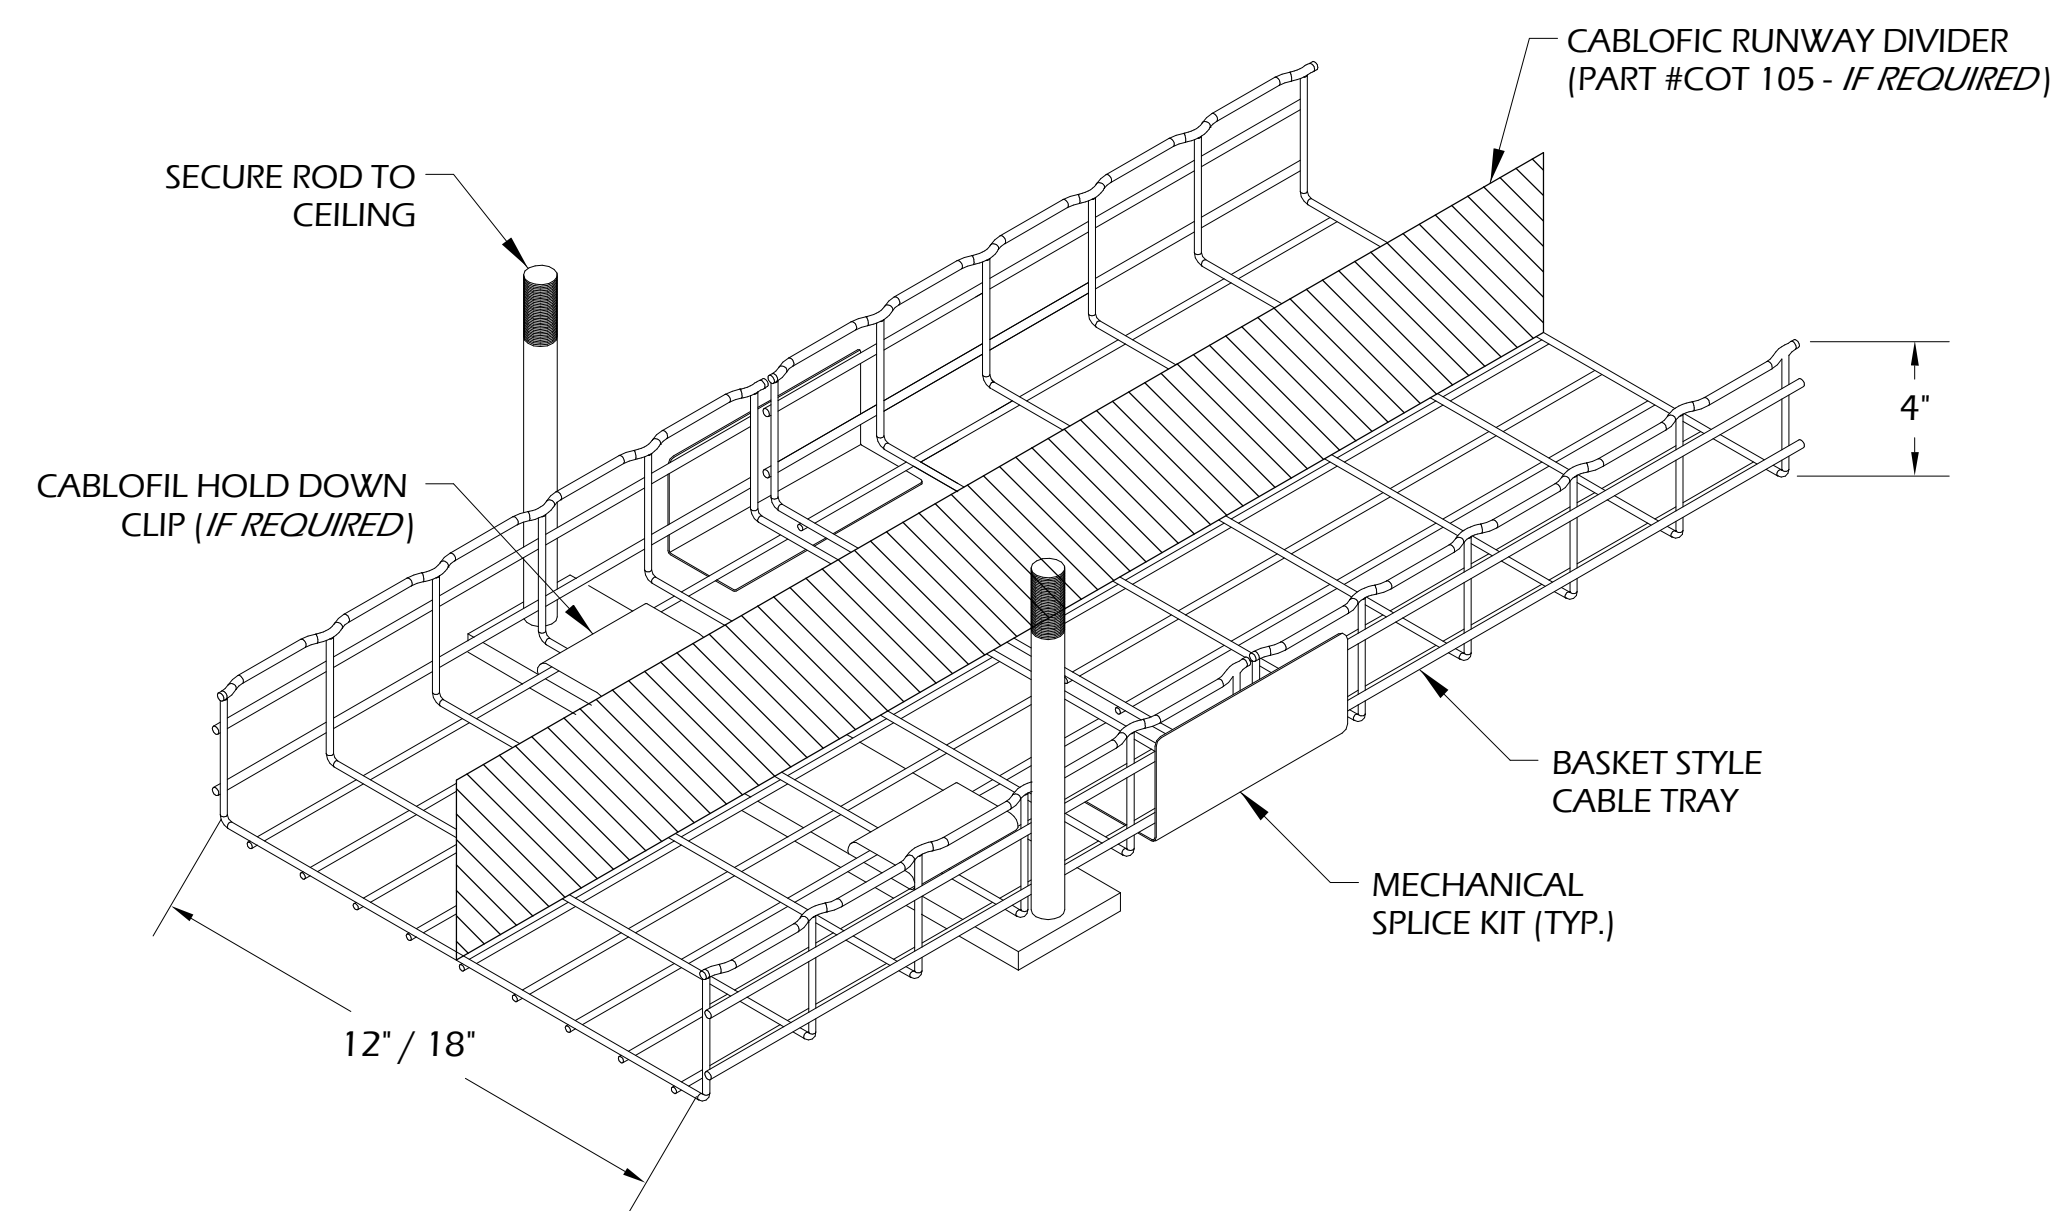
ACCESSIBLE CEILING CABLE INSTALLATION DETAIL
